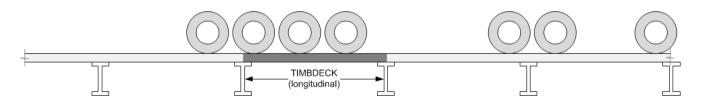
Typical bridge elevation showing longitudinal timber deck arrangement
